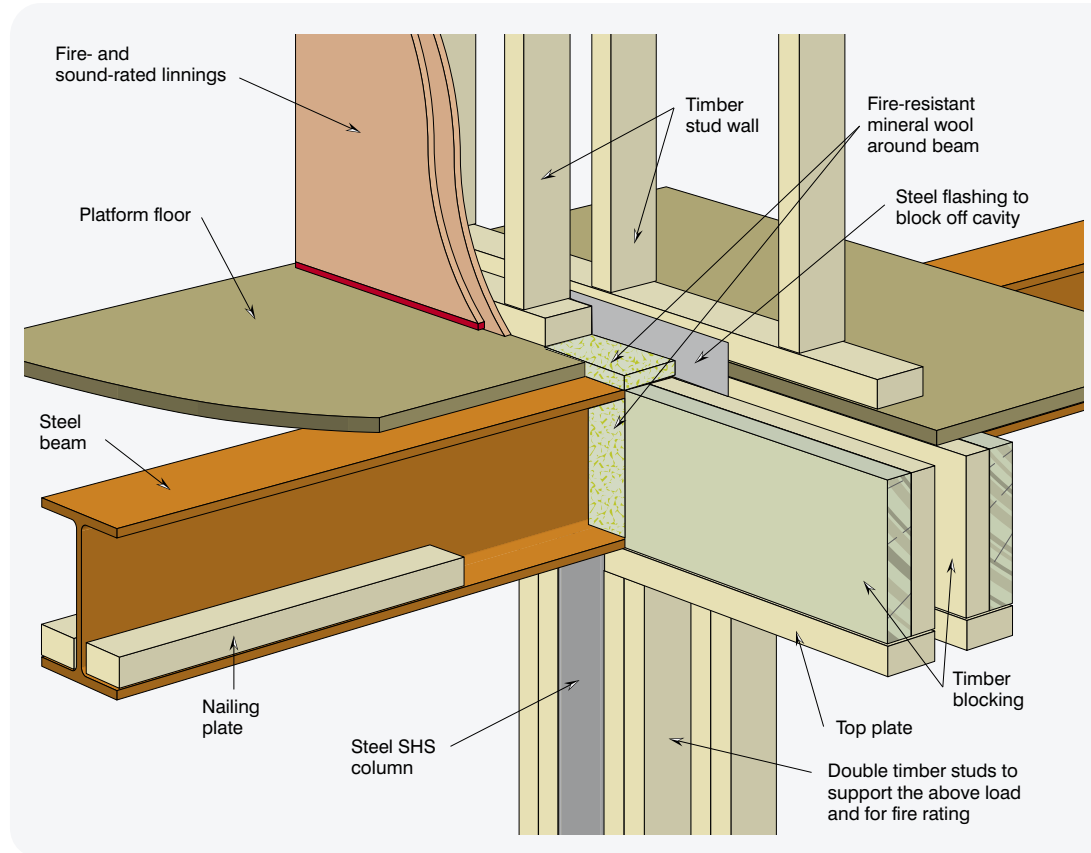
Cut away view of steel beam and column housed in a timber-framed separating wall – perspective view from above.
